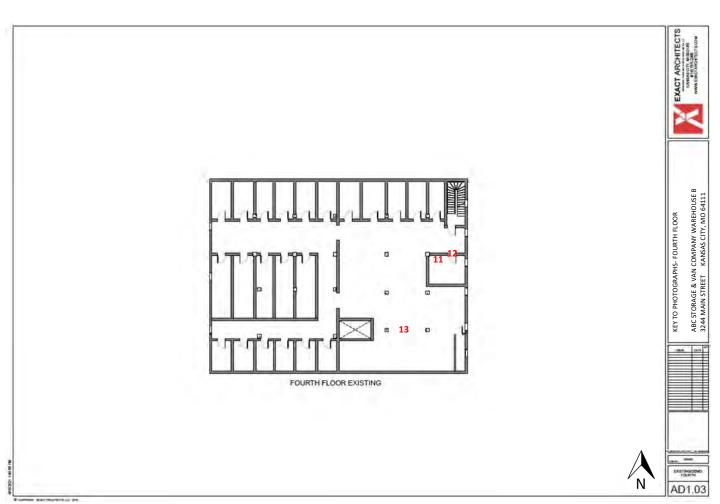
ABC Storage & Van Company Warehouse B current floor plan and key to photographs, fourth floor.
